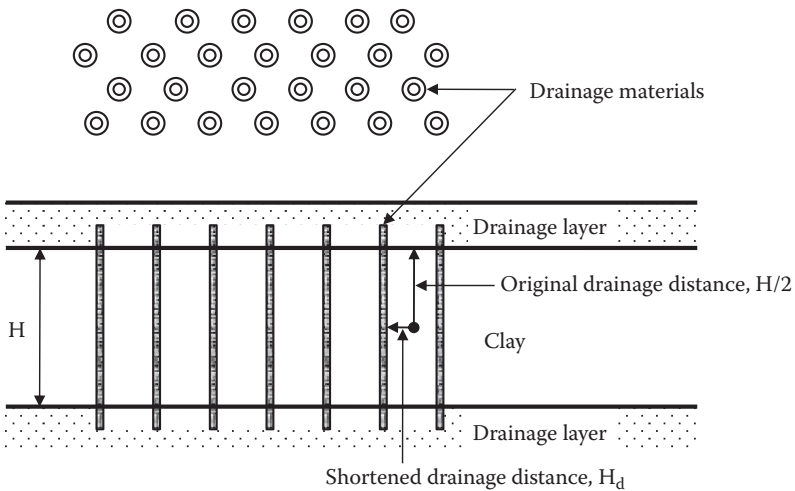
Principle of vertical drain (paper, wick, and sand drain) techniques.
